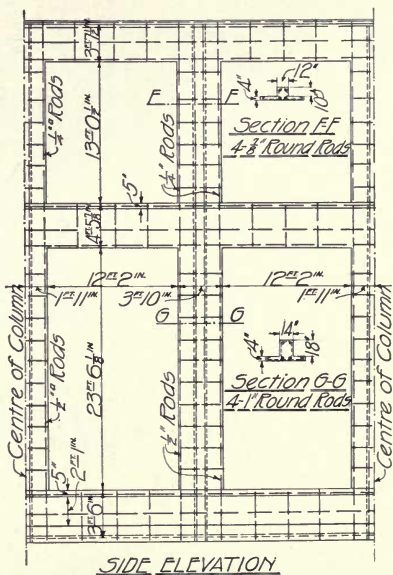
Side Elevation of the Bullock Machine Shop. (See p. 89.)
